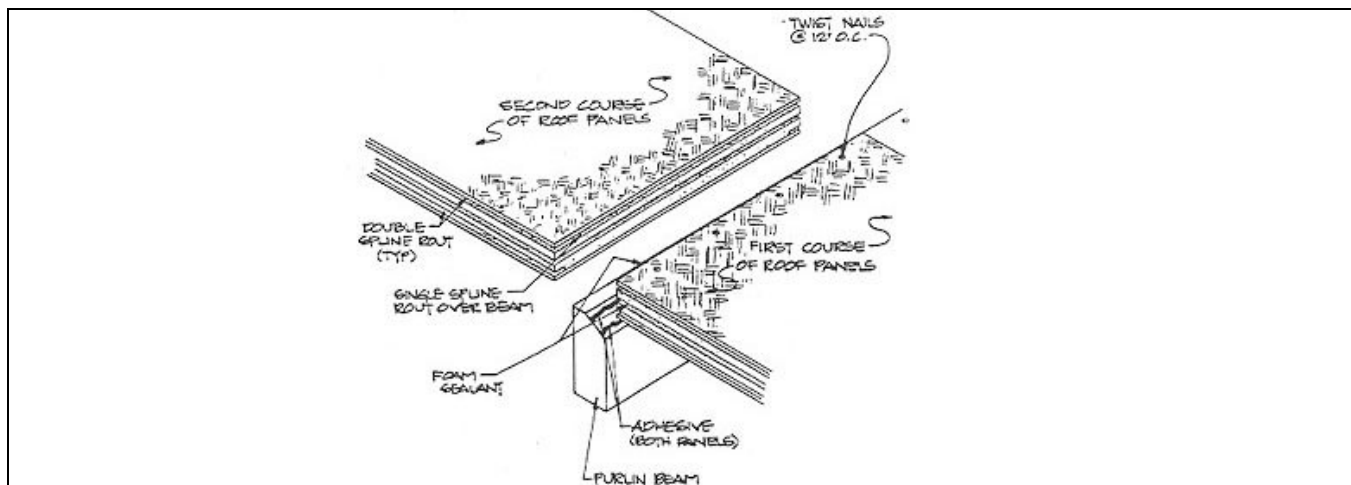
Installing Second Course of Roof Panels: After the bottom course of panels is in place, install the second course from the purlin to the ridge beam. Panels are joined with a single plywood spline as well as twist nails into the purlin. Apply foam sealant after joining panels.
